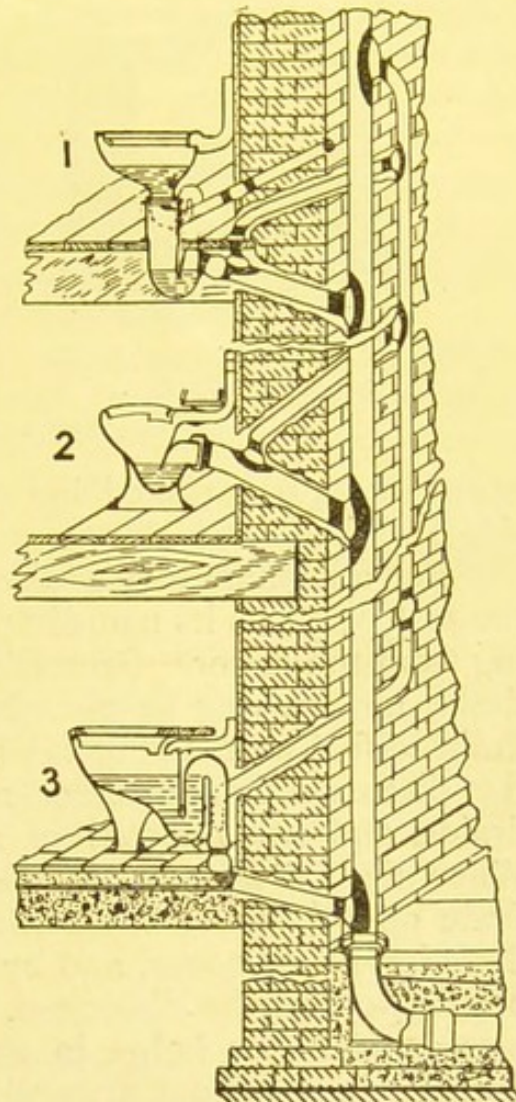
Water-closets on different floors opening into a soil-pipe placed against the outside wall of the building.
